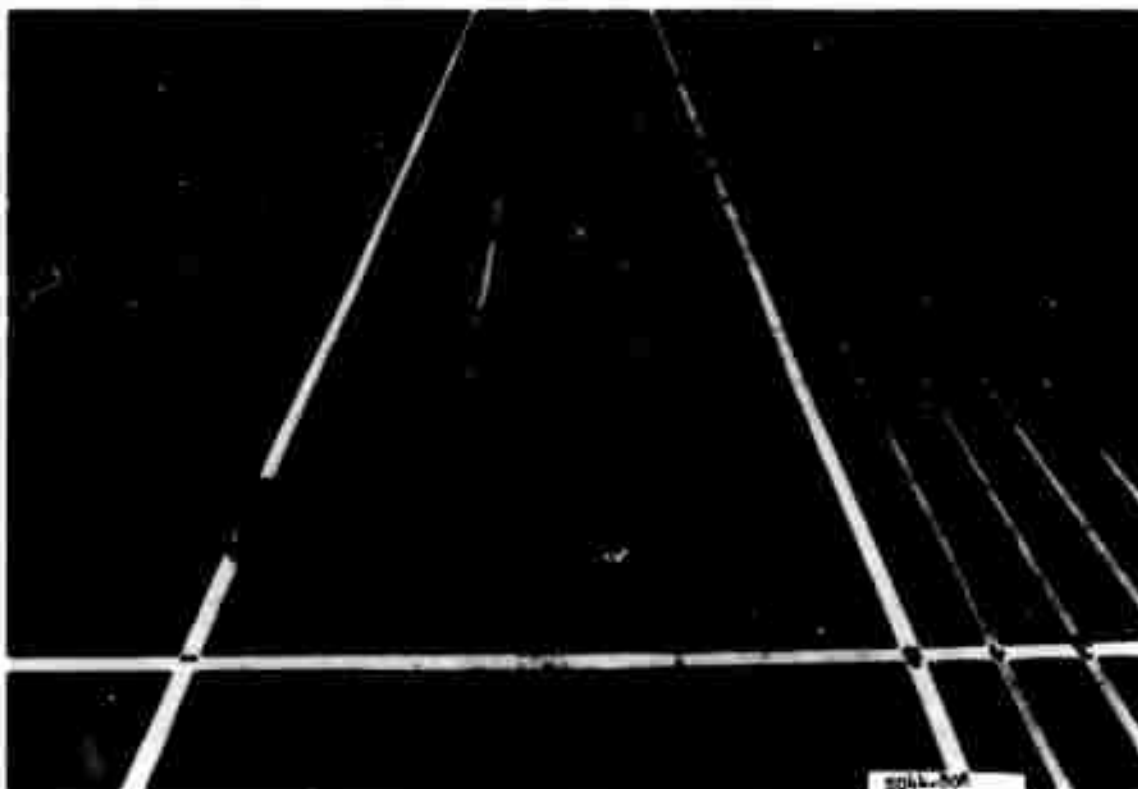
Item 1, lane 1, flexible pavement test section, prior to traffic
